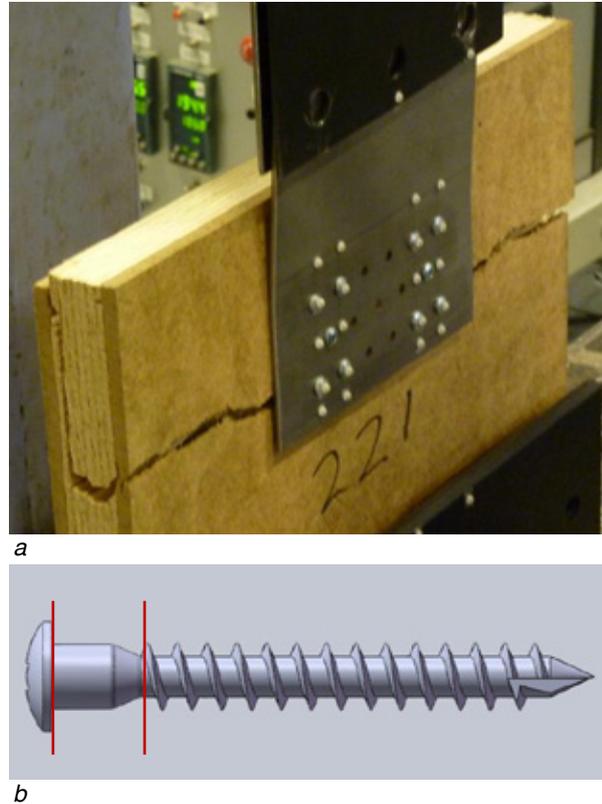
(a) Tensile failure of plyboard in the eccentric shear test with the ten screw configuration. The failure was brittle due to the eccentric loading which caused the front fibreboard to essentially carry the entire load. The six screw configuration failed in the same manner; (b) Failure of the anchor screw occurred at the same two locations for both the shear and the withdrawal tests as indicated by the red lines – at the head and at the transition between the unthreaded portion and the threaded portion of the shank. Screw size 5.0×40 mm.
